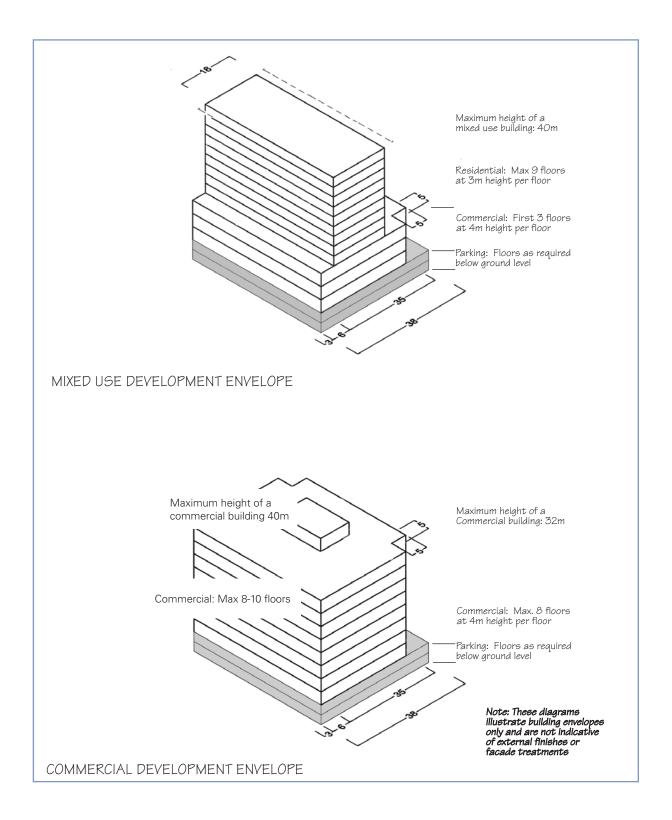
(j): North Precinct (George Street) building height illustration.(I)
